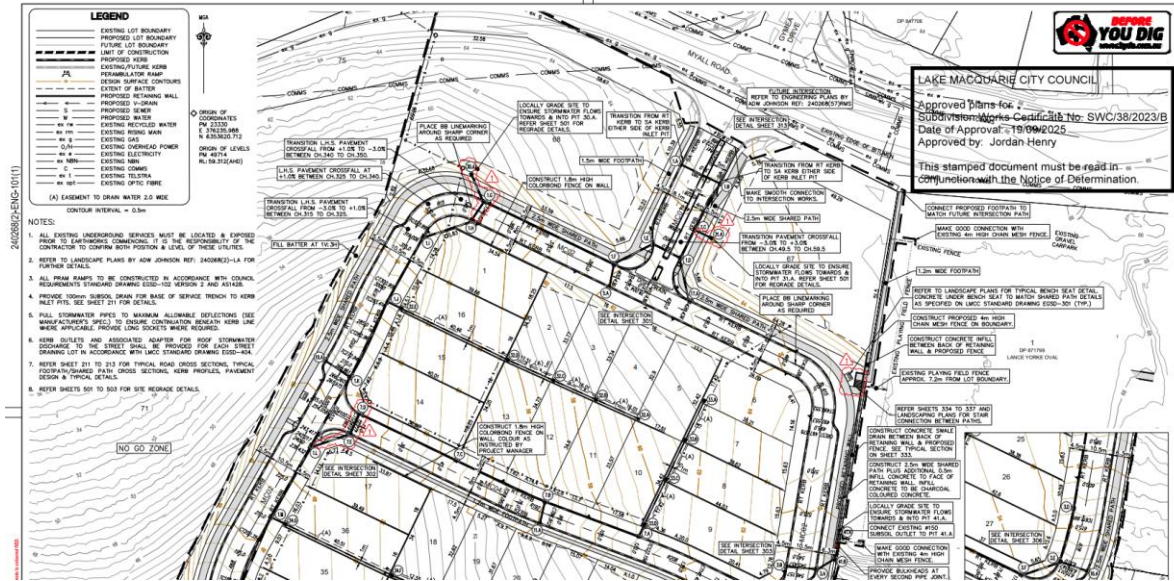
Stamped approved civil plans – proposed subdivision
